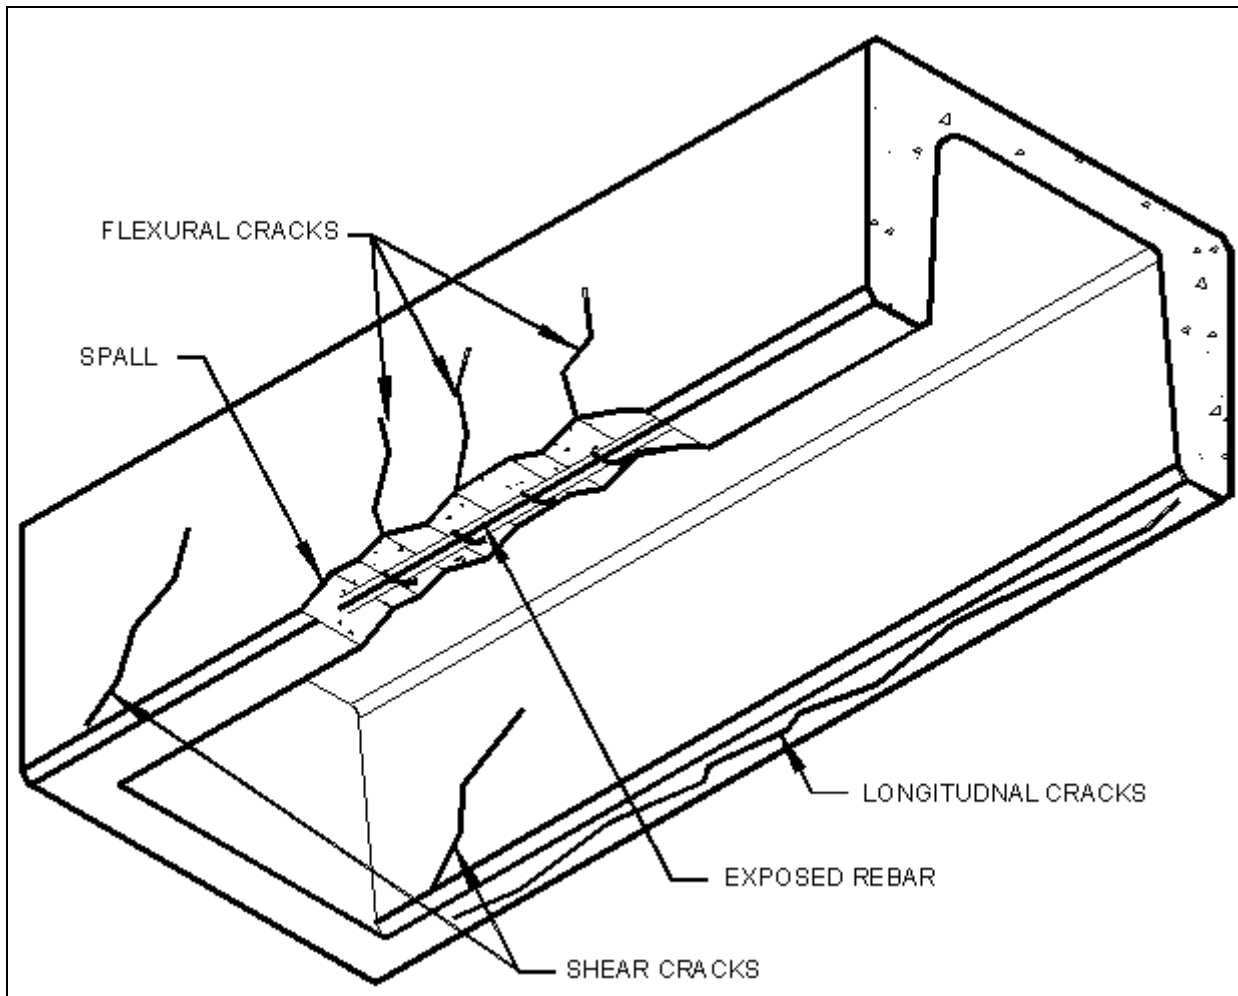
Typical Standard Reinforced Channel Girder with Defects Illustrated
